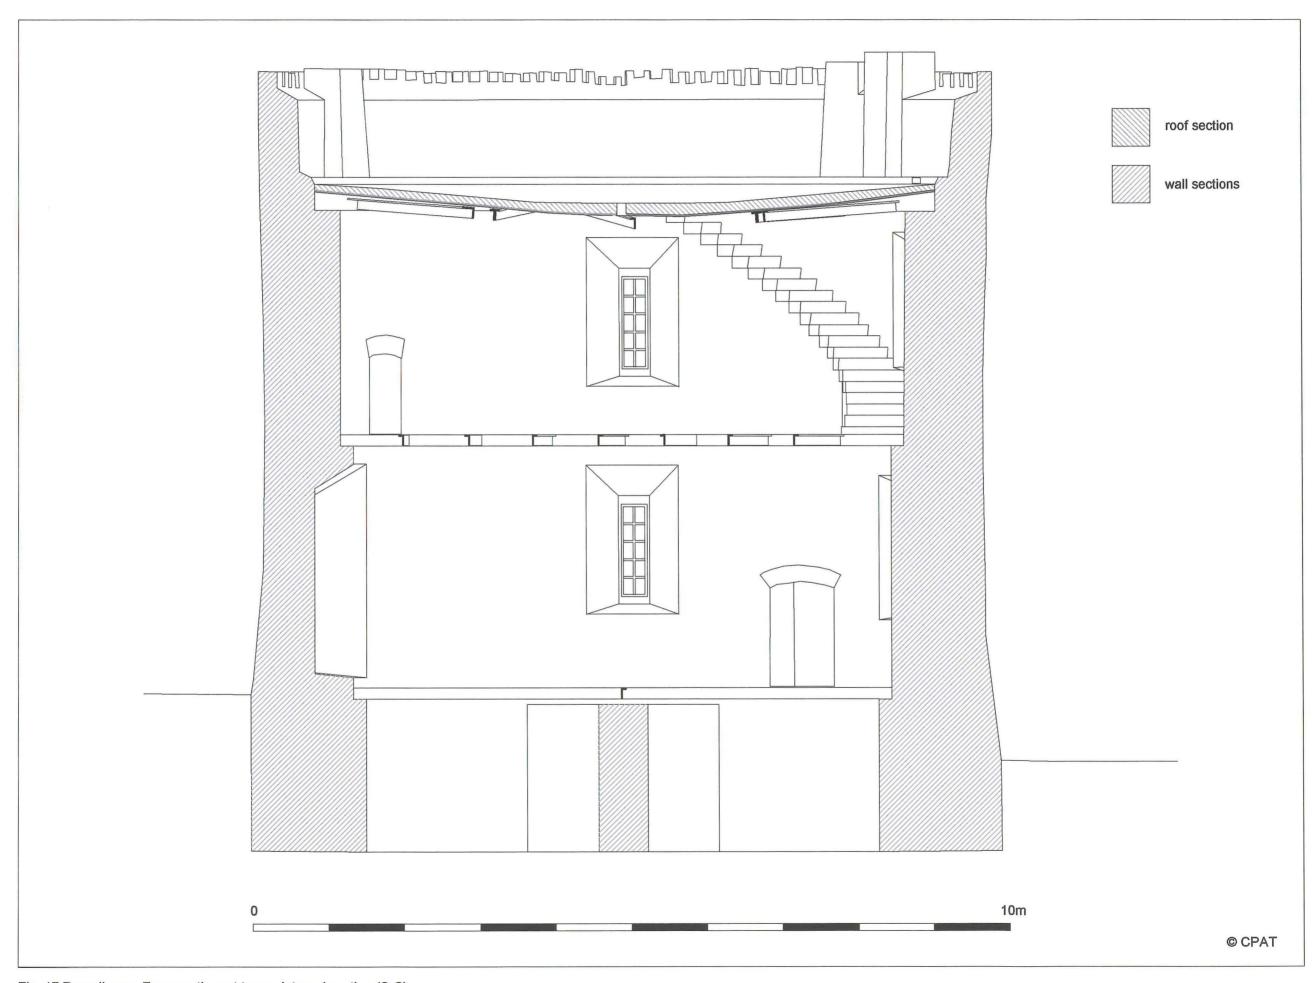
Roundhouse Farm north-east tower, internal section (C-C)
